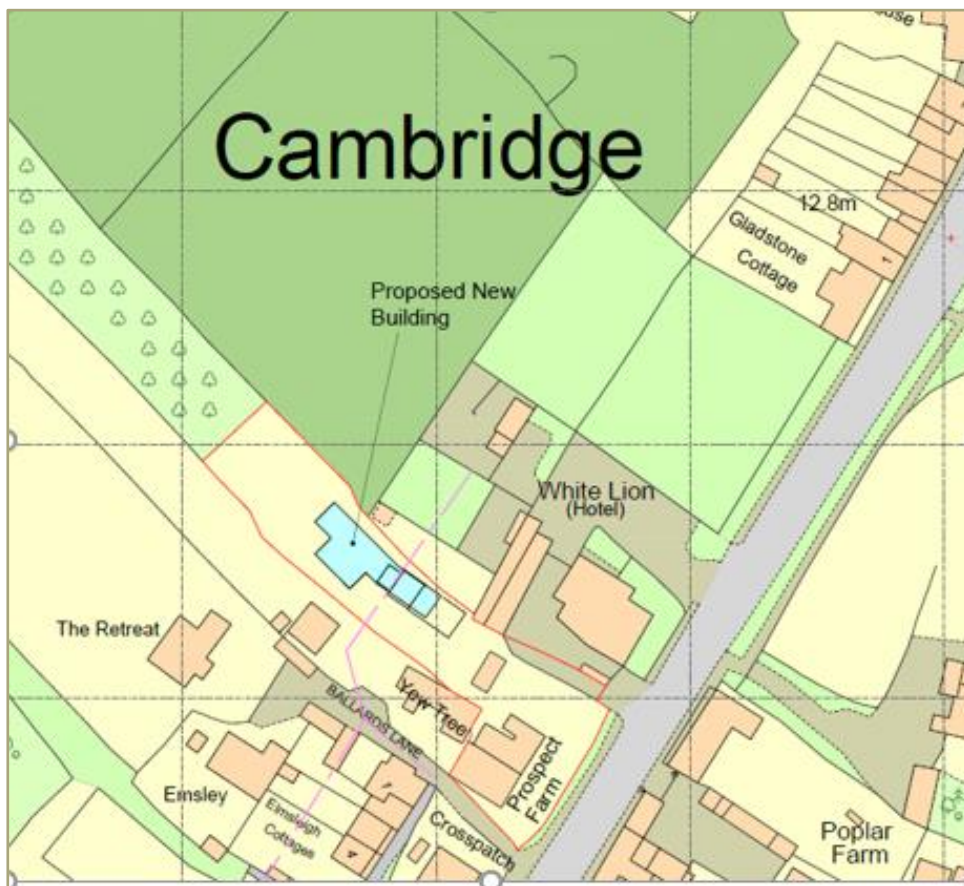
Extract from proposed block plan showing proposed dwelling in blue and the outline of the existing outbuildings.
